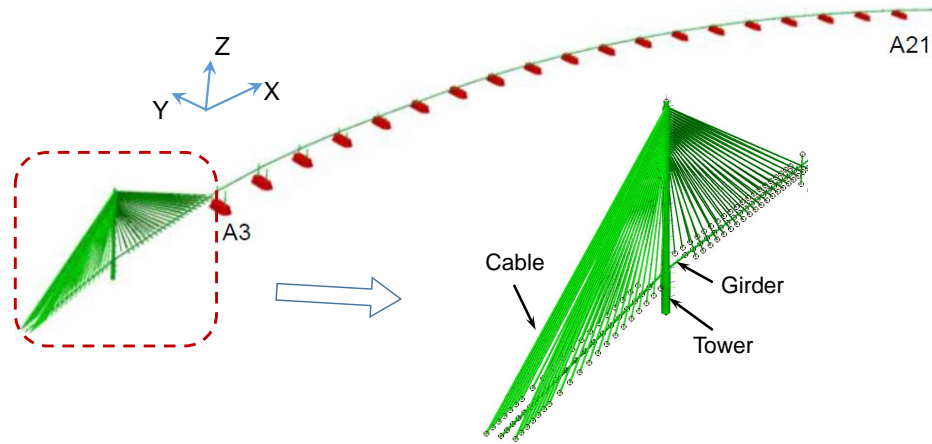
The end anchored curved floating bridge model including a cable stayed high bridge and a pontoon supported low bridge [12].
